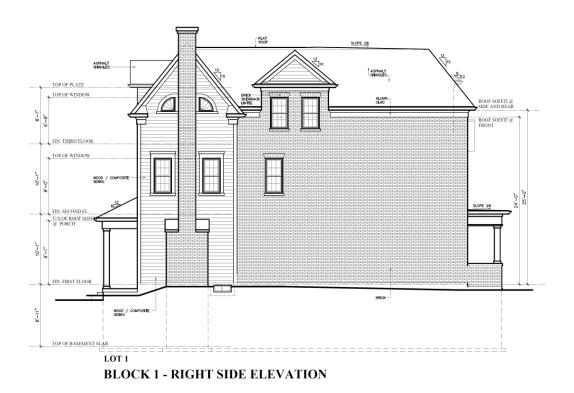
Block 1 Right Side Elevation, Sheet A3 (FBP Architects Inc., September 1, 2023)
